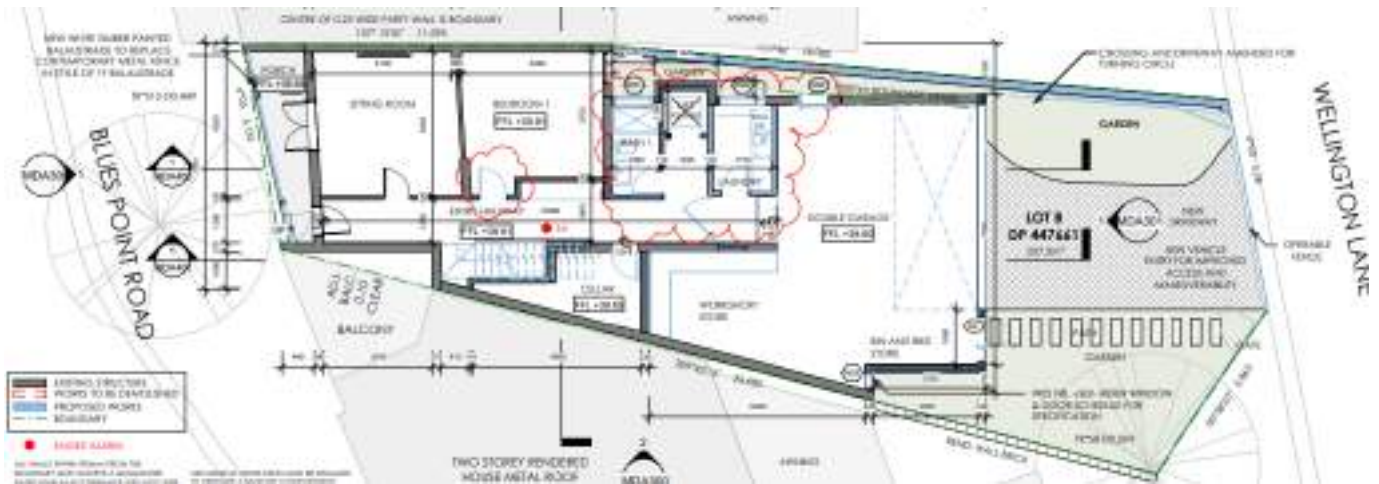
Ground floor plan showing lift realigned 450mm outwards from northern wall
